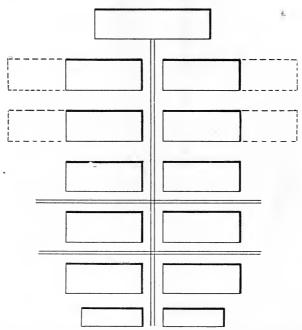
Plan of buildings as used on new car shops of the Canadian Northern Railroad Company.
